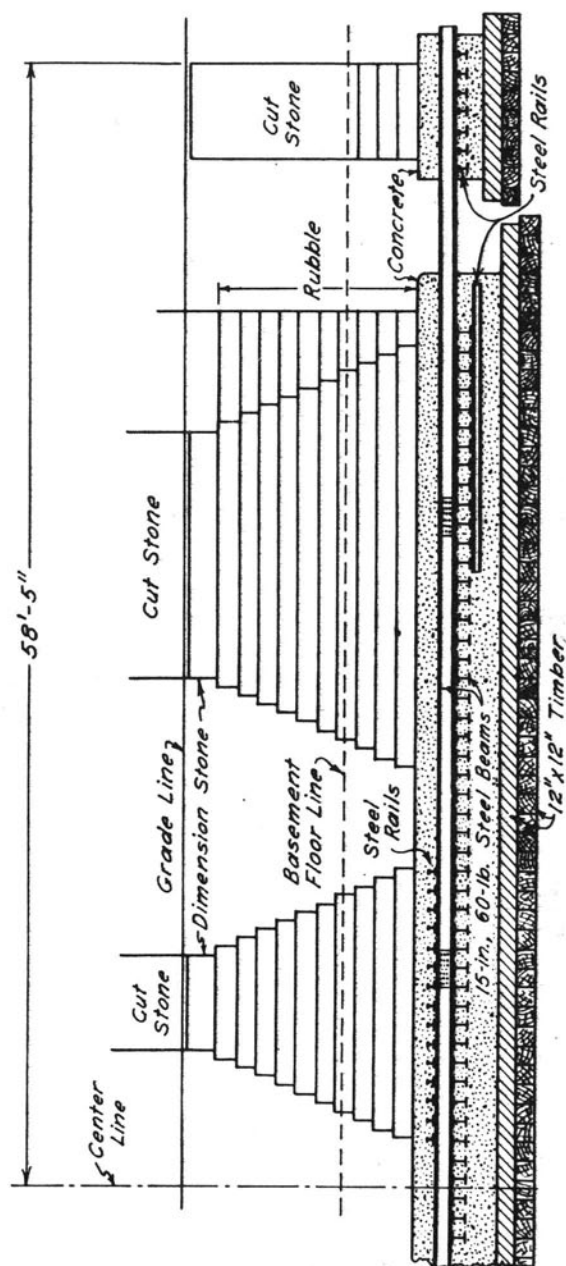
TOWER FOUNDATION OF AUDITORIUM
